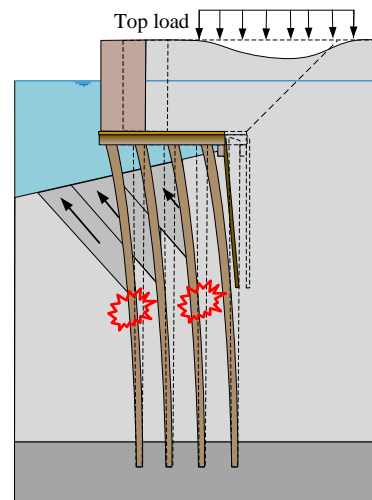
, Failure mechanism 'Lateral failure of the quay wall foundation'.
